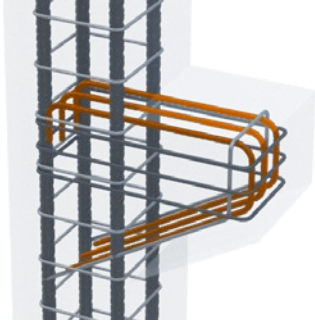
CONCRETE CORBEL REINFORCED BY HOOKED REINFORCEMENT
